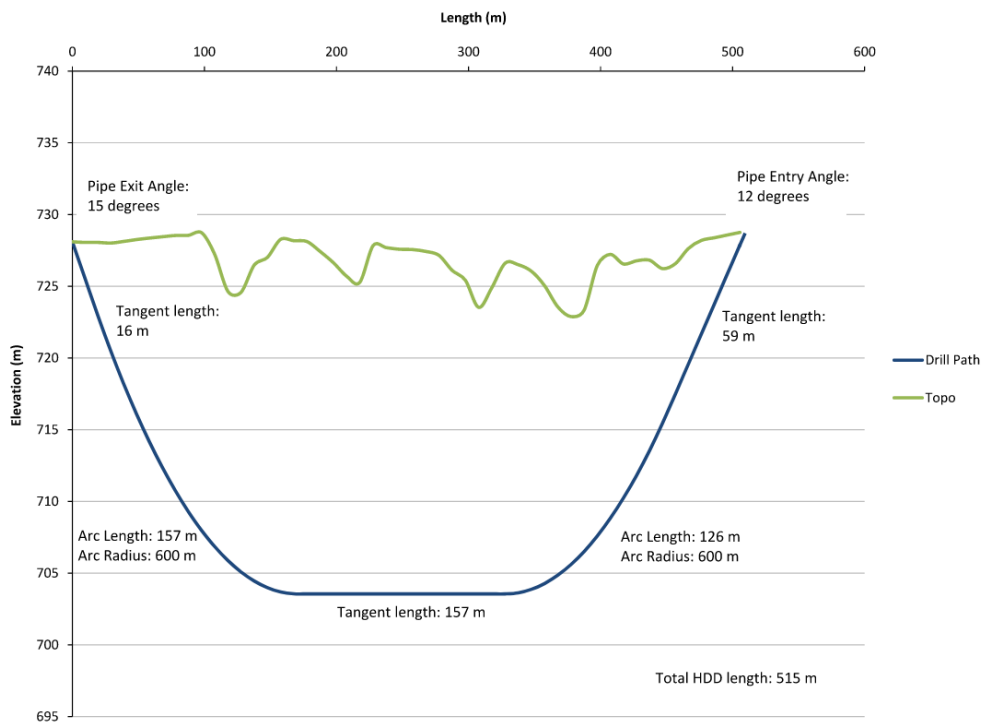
Drill path geometry for Case 2 HDD crossing
